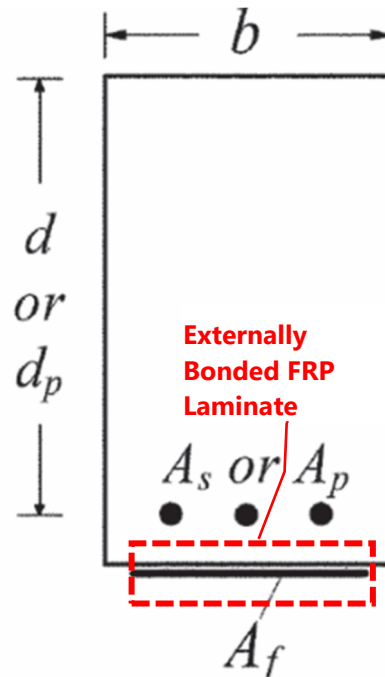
Section view of a reinforced concrete beam strengthened with an externally bonded FRP laminate (adapted from ACI 440.2-23)
